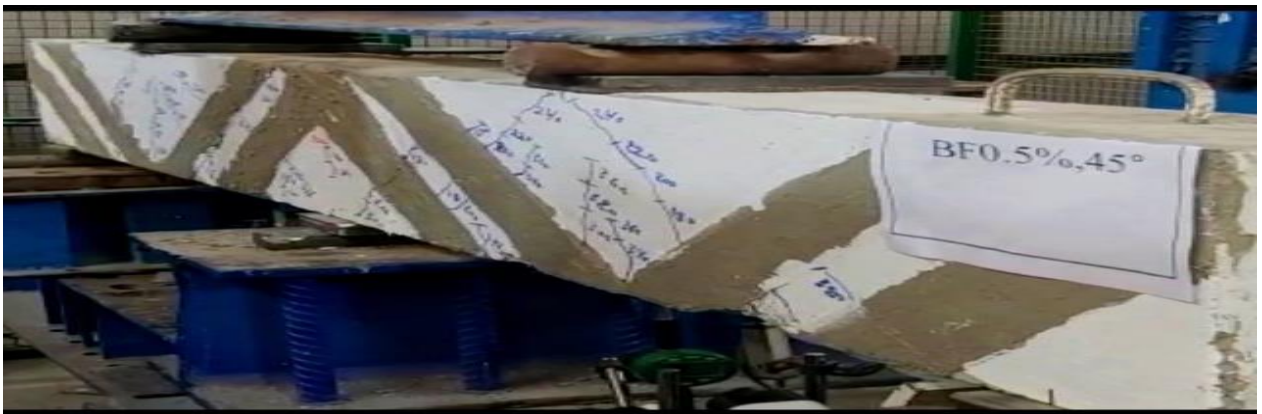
Cracks pattern after failure for (BF0.5%,45°) beam
